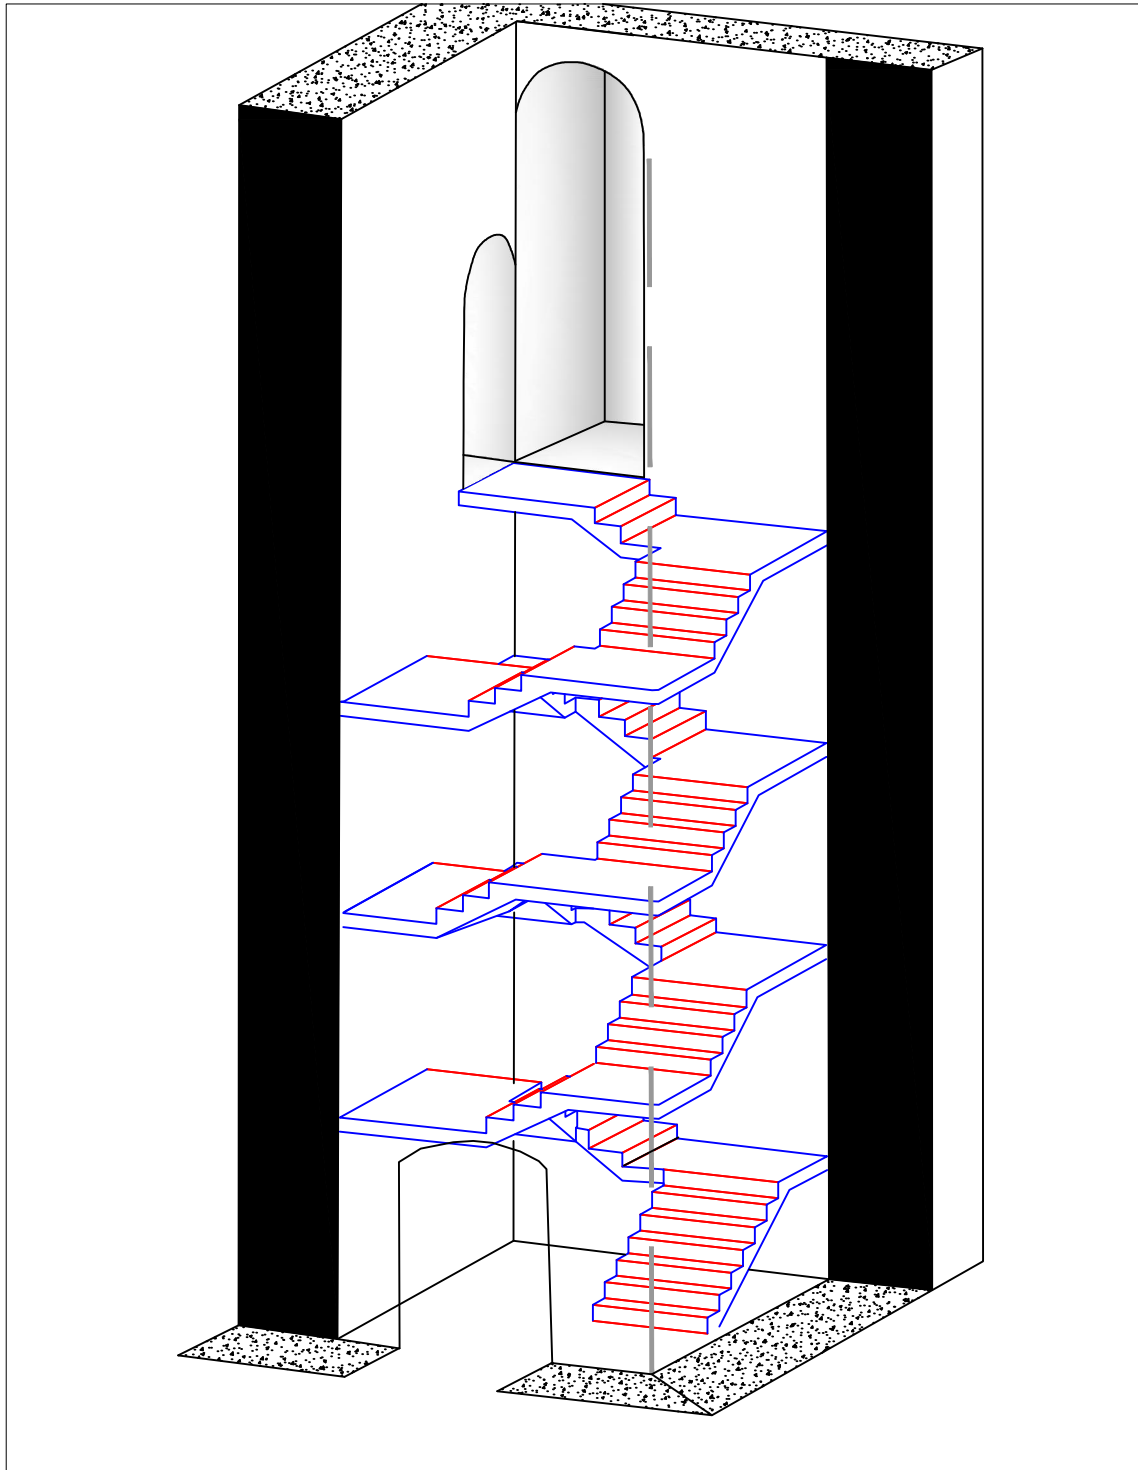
Isometric cut-away of stair tower viewed from the southwest, showing possible stair arrangement. Bannisters and supports omitted for clarity. Note that door at top is on the left - the archway on the right is a deep niche with solid back wall.
